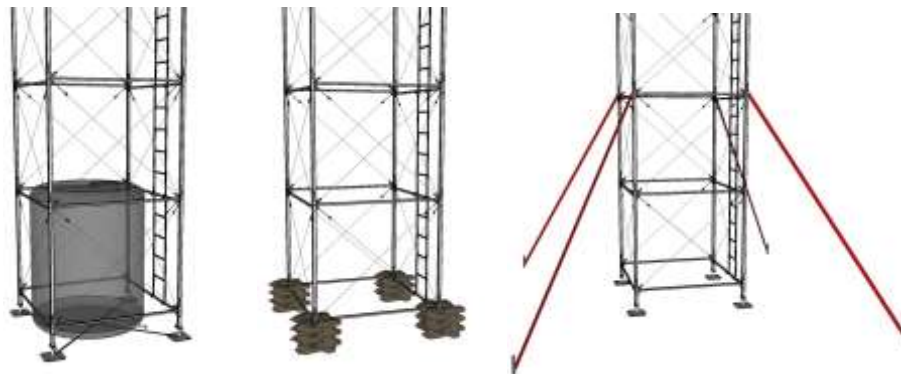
Potential solutions for application of temporary anchoring/foundation in order to prevent overturning.
